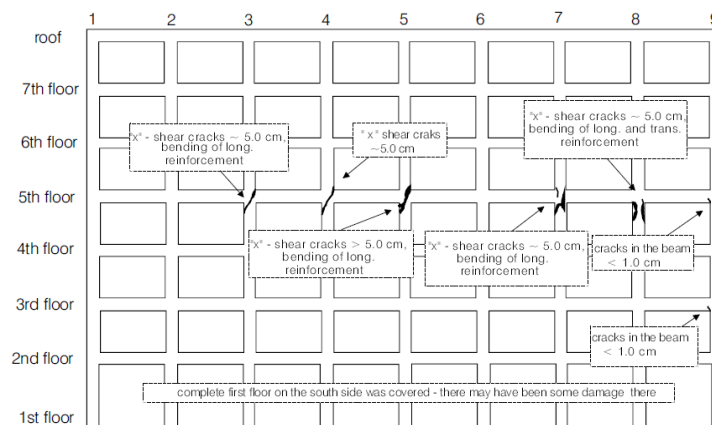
Structural damages on the South A facade of the Van Nuys Building, after Northridge earthquake, detected by Trifunac et al. in the survey of 04/02/1994
